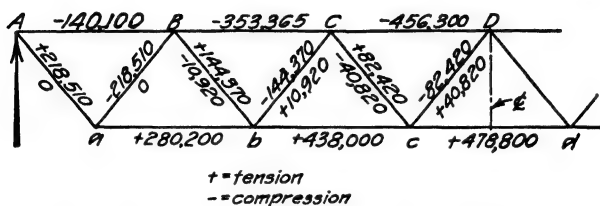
Live load stresses, deck Warren truss Coopers E-50 loading.
